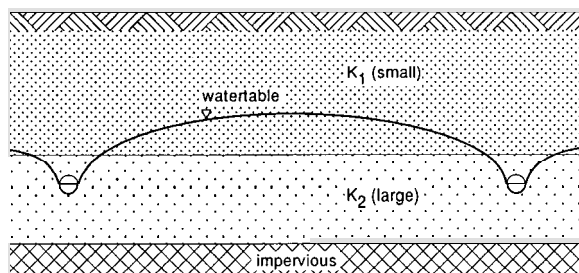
Drains in a layer with high hydraulic conductivity under less permeable heavy clay topsoil
